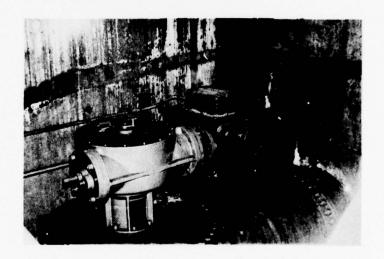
Valve shaft and 30-inch diameter cone valve on right side 48-inch diameter pass of raw water line; looking upstream
